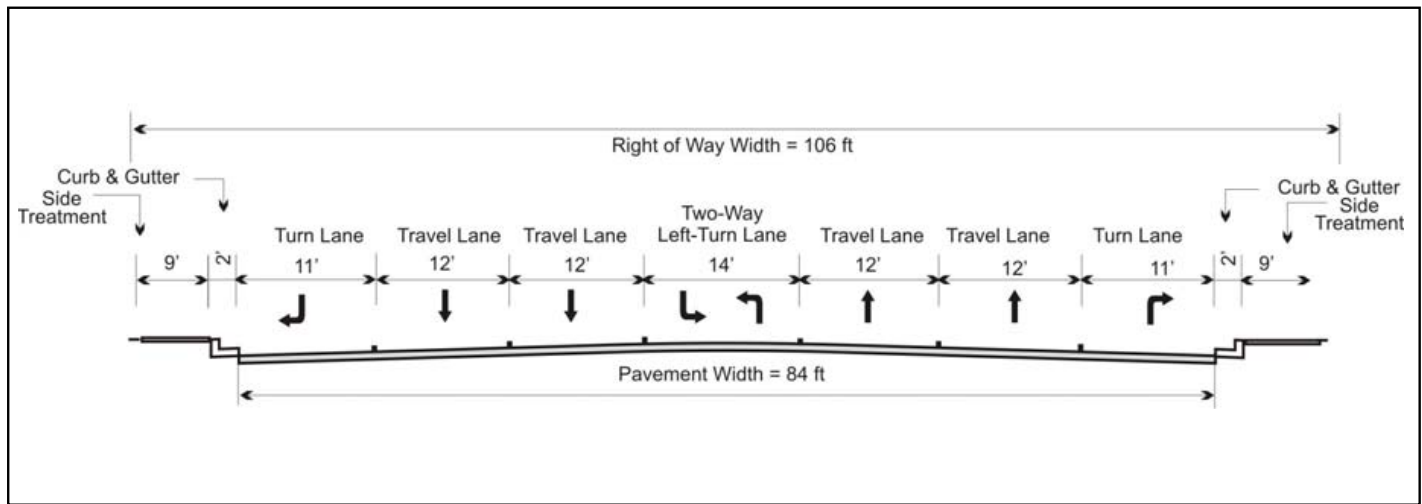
Five-lane Arterial Cross-section, Between Intersections
